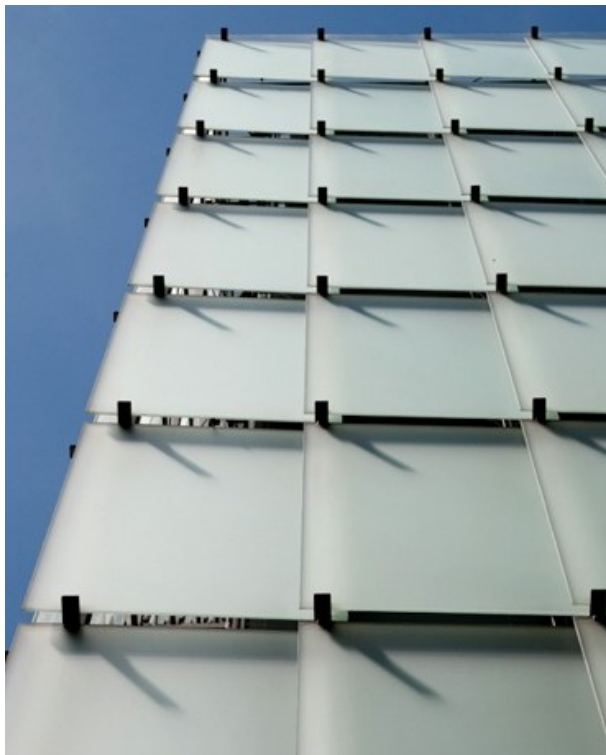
Facade system: shingles. Non-structural panels on fixtures
